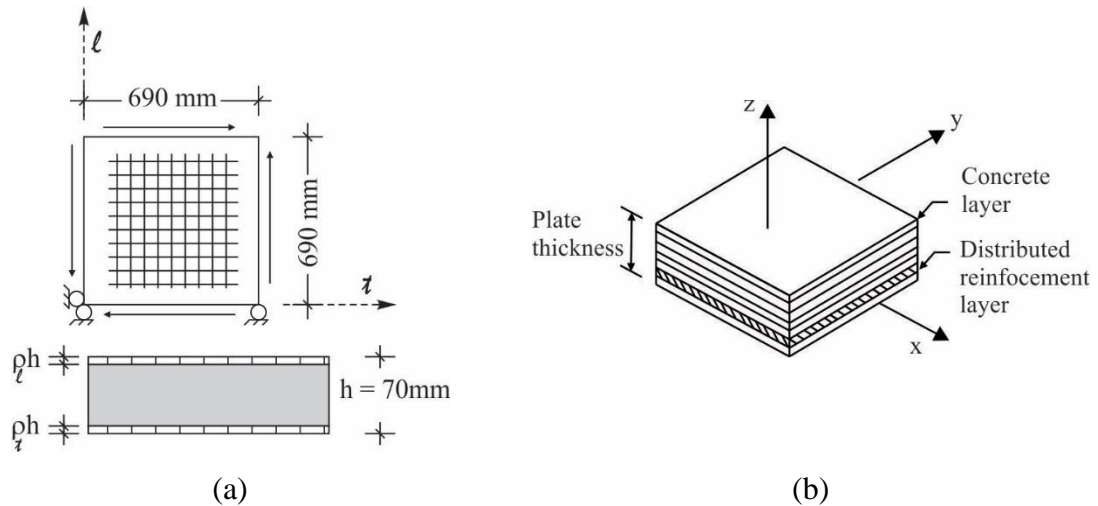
Finite element model (a) Plane stress element and (b) Plate bending element. Adapted from Barzegar (Barzegar 1988) and (Barzegar 1989).
